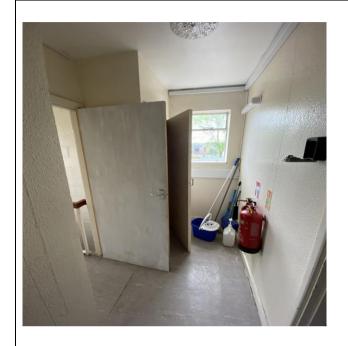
Door at head of stairs and electrical cupboard door. Replacement required.
